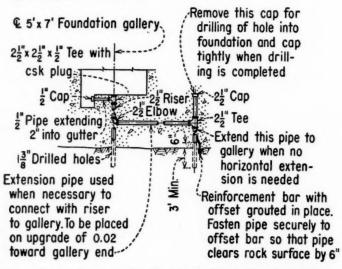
TYPICAL HOLE AND PIPE DETAILS, HUNGRY HORSE DAM IN MONTANA
